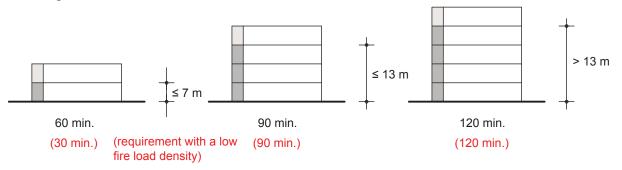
Requirements for the main load bearing structure of residential buildings Source: Verdiepingbouw met staal; Redrawn by the author
